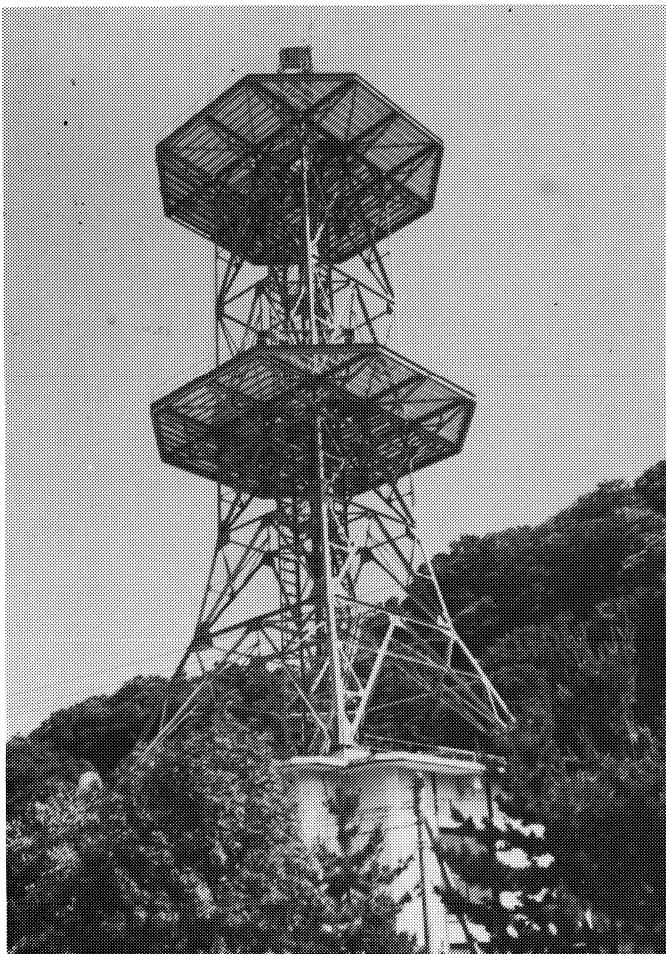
Okushiri-cho remote control switch building; close-up of the approximately 40-m freestanding steel truss microwave tower atop the building.
